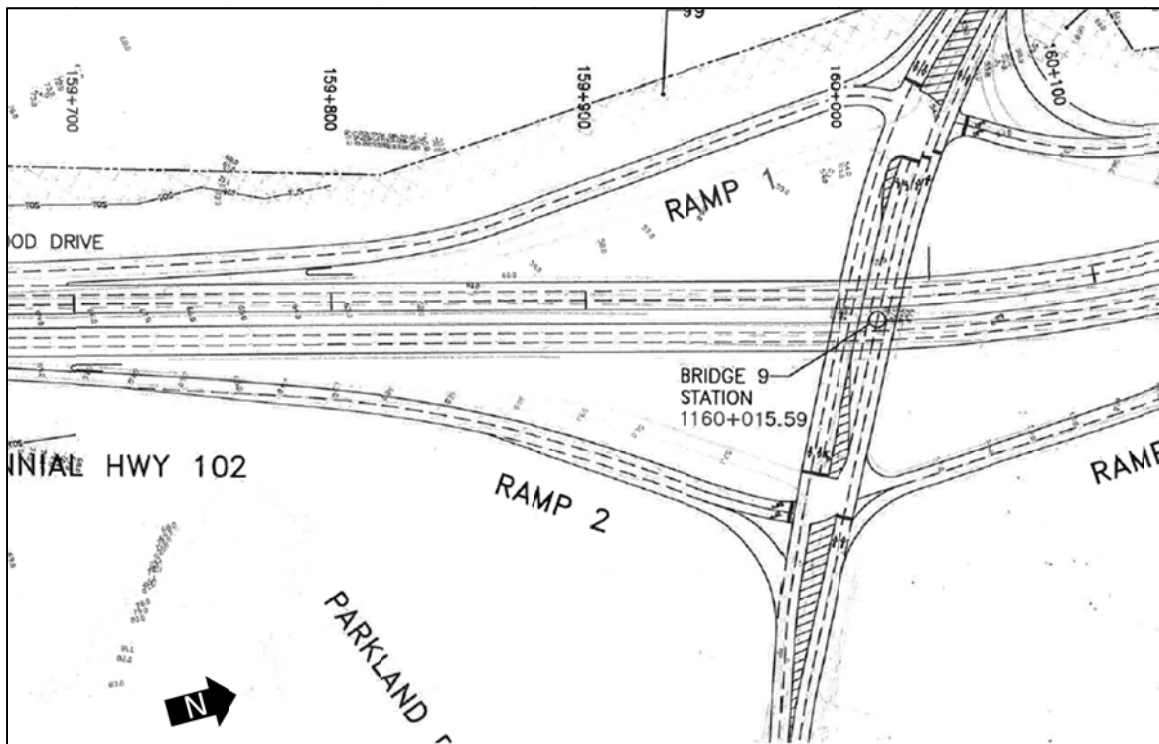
Conceptual Plan: Highway 102 at Kearney Lake Road
